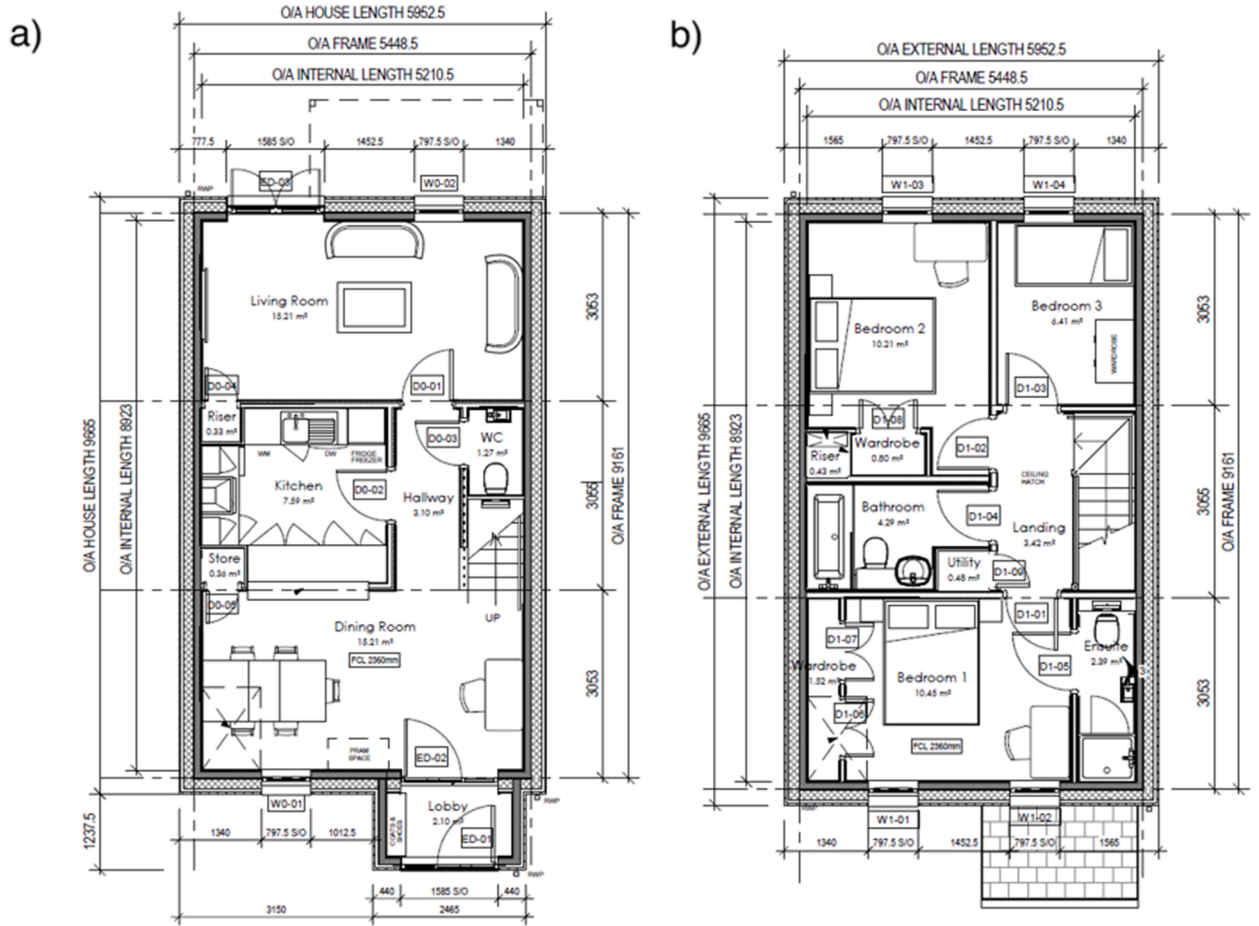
Layout of typical superstructure: a) ground floor plan; b) first-floor plan.
